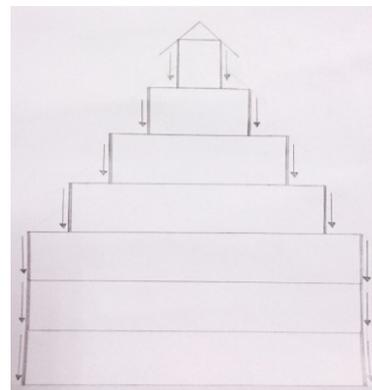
Load is transferred from seventh floor to the first floor through columns (Load path)
